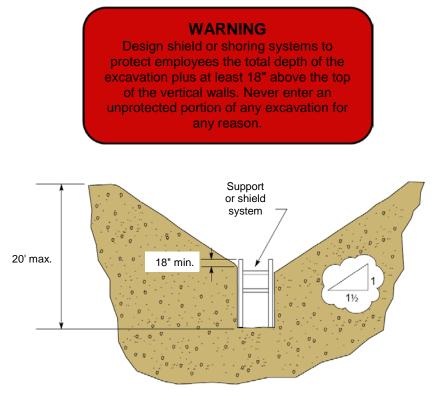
Type C soil: trench shield installed in sloped excavation
